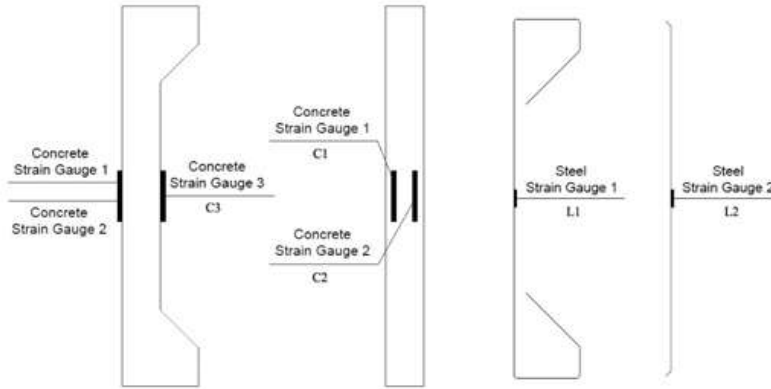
Layout of concrete and steel strain gauges' locations on the specimen
